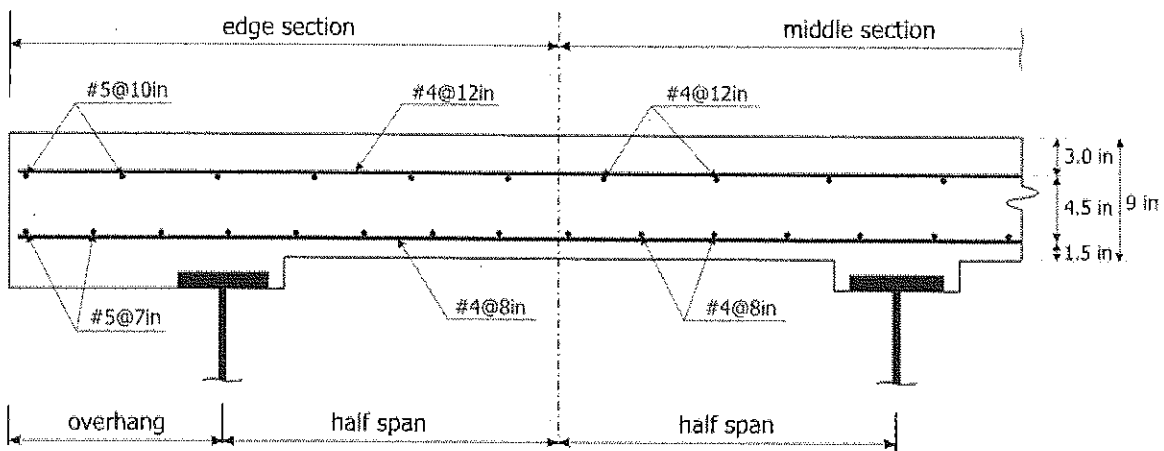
Edge cross section of the deck (doubled longitudinal empirical reinforcement).
